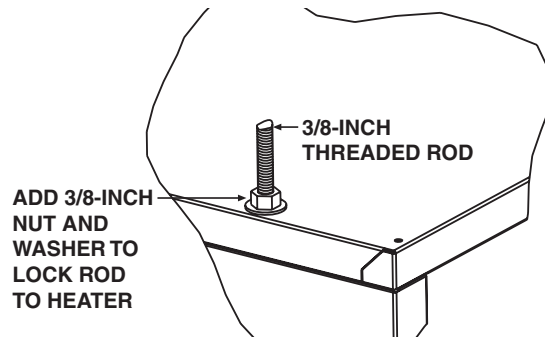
Heater Suspension Using Field-Supplied Threaded Rods
